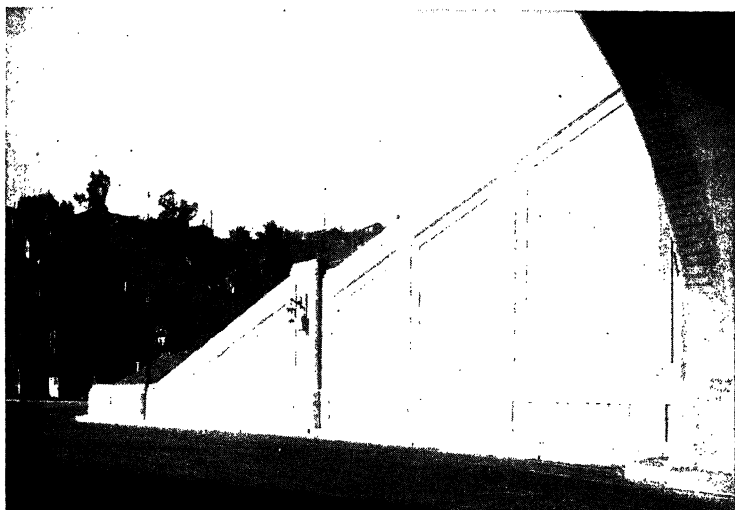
Retaining wall at portal of Figueroa Tunnel, Los Angeles, Calif.
